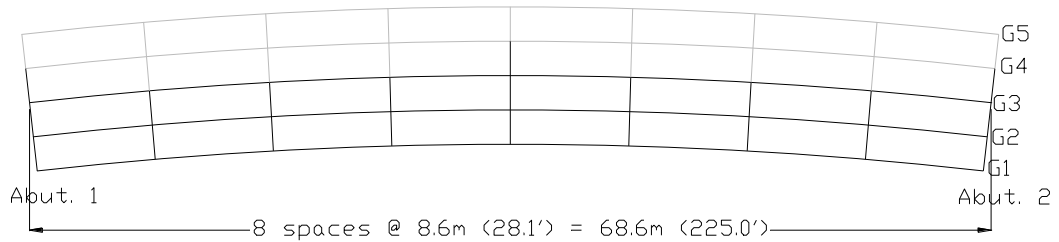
Stage 2 of Construction for Paired Girder (Inner Girders Placed First) Erection of Single-Span, 5-Girder, 305-m (1000-ft) Radius Bridge.
